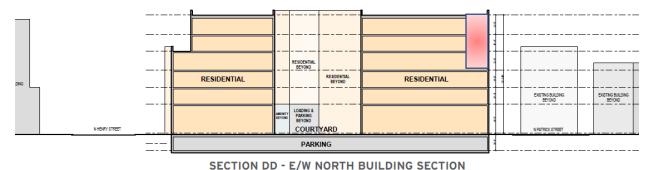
Section through north building showing location of potential shoulder along east side of buildings
